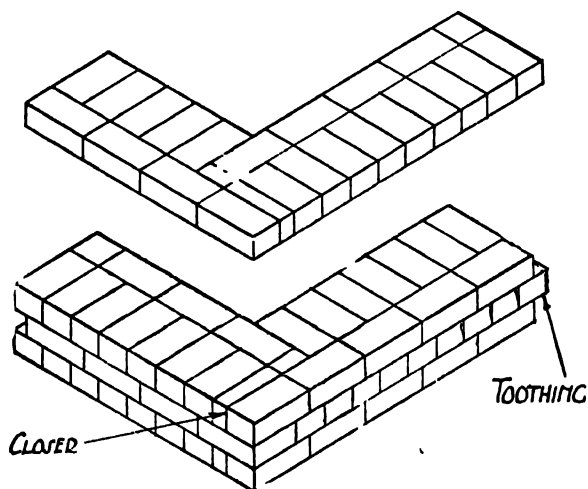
ONE & HALF BRICK WALL IN ENGLISH BOND
